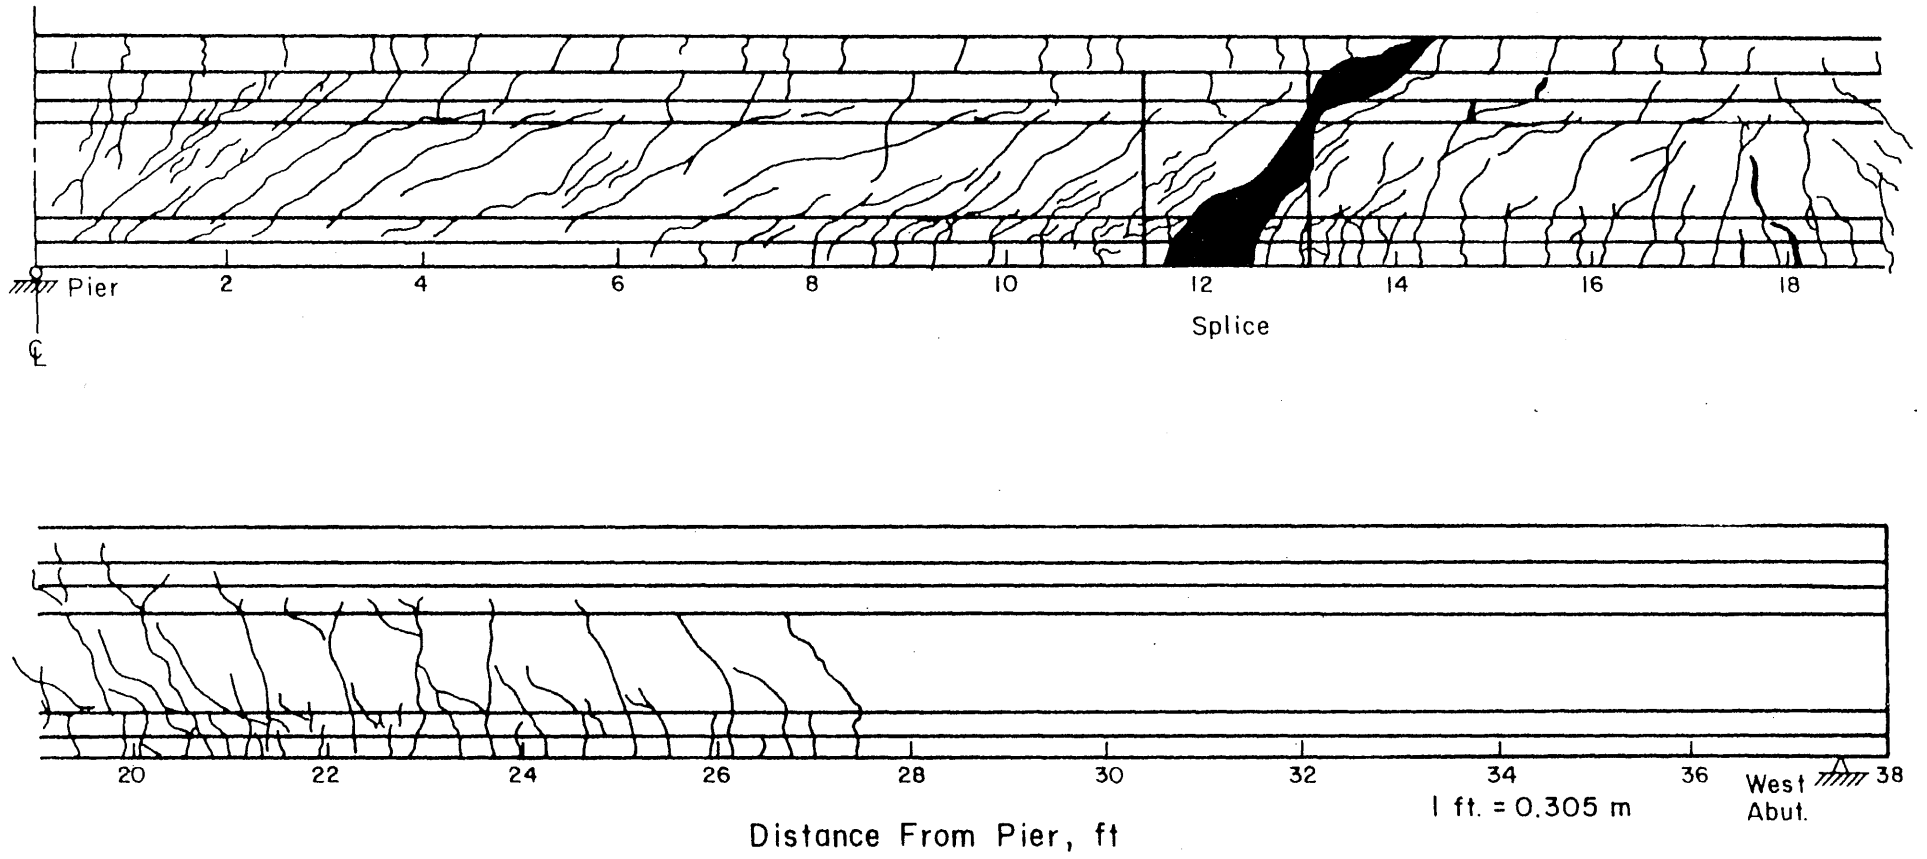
CRACKS IN WEST SPAN AFTER COMPLETION OF TESTING, MODEL 2
